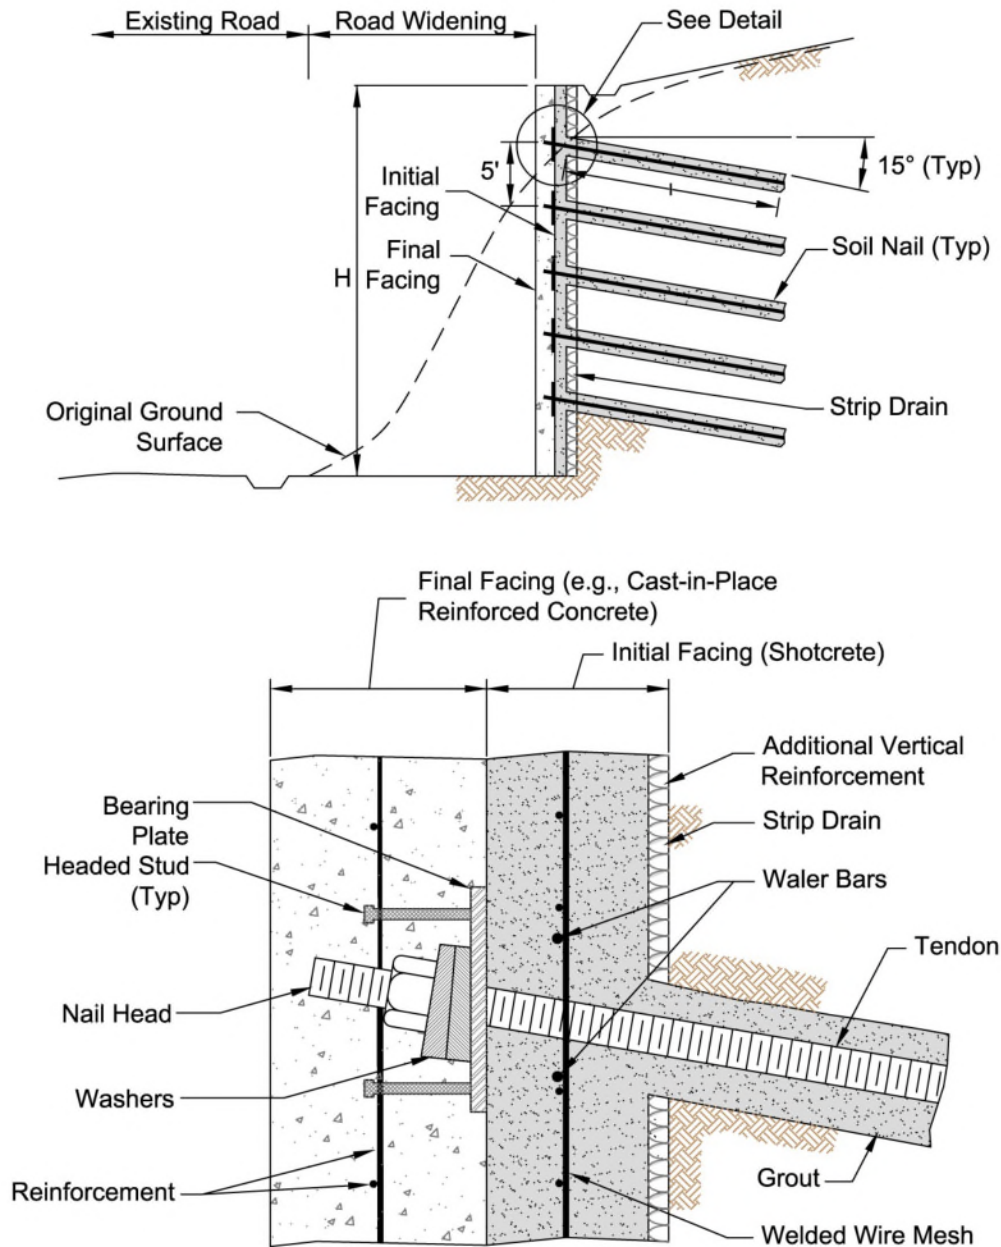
General Cross-Section of a Soil Nail Wall (after Soil Nail Walls Reference Manual, 2015, FHWA-NHI-14-007)
